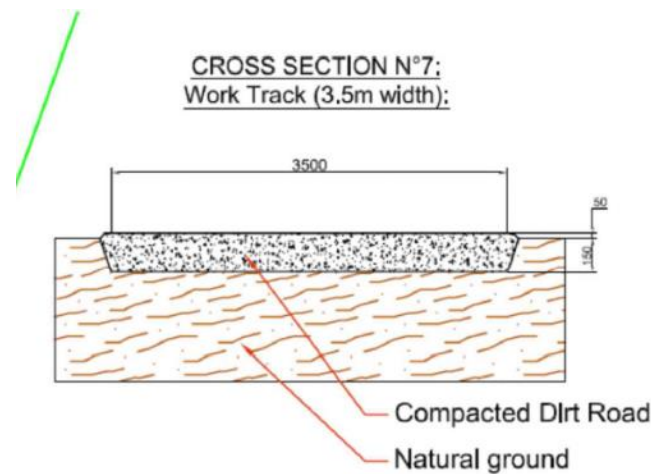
Typical internal track design, width is not indicative of the actual tracks
